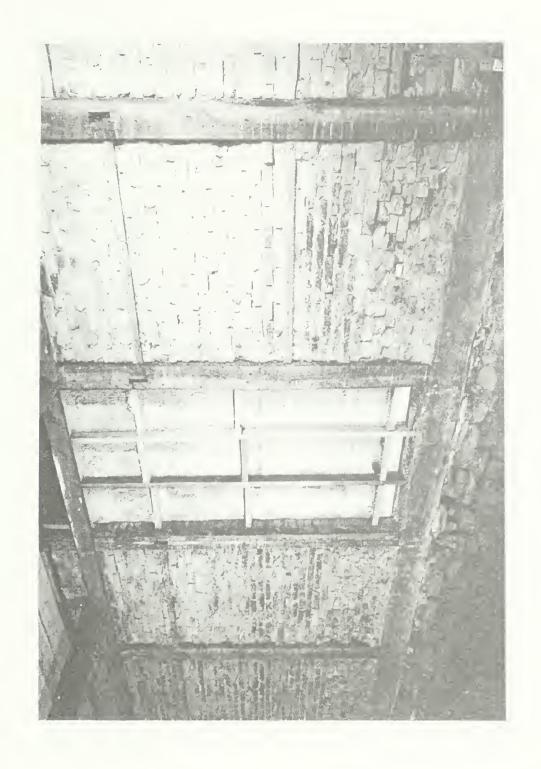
Schuyler House: Exposed framing of exterior east (rear) wall; mortises in studs were used for horizontal ties or joists for 1787 porch located south of Father's Office (November 1959).
